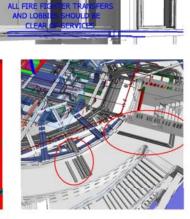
DETAIL DESIGN DUBAI CREEK HARBOUR - THE TOWER, DUBAI
